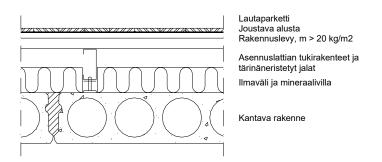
The structural principle of the installation floor. (Source: RIL 243-1:2007)
